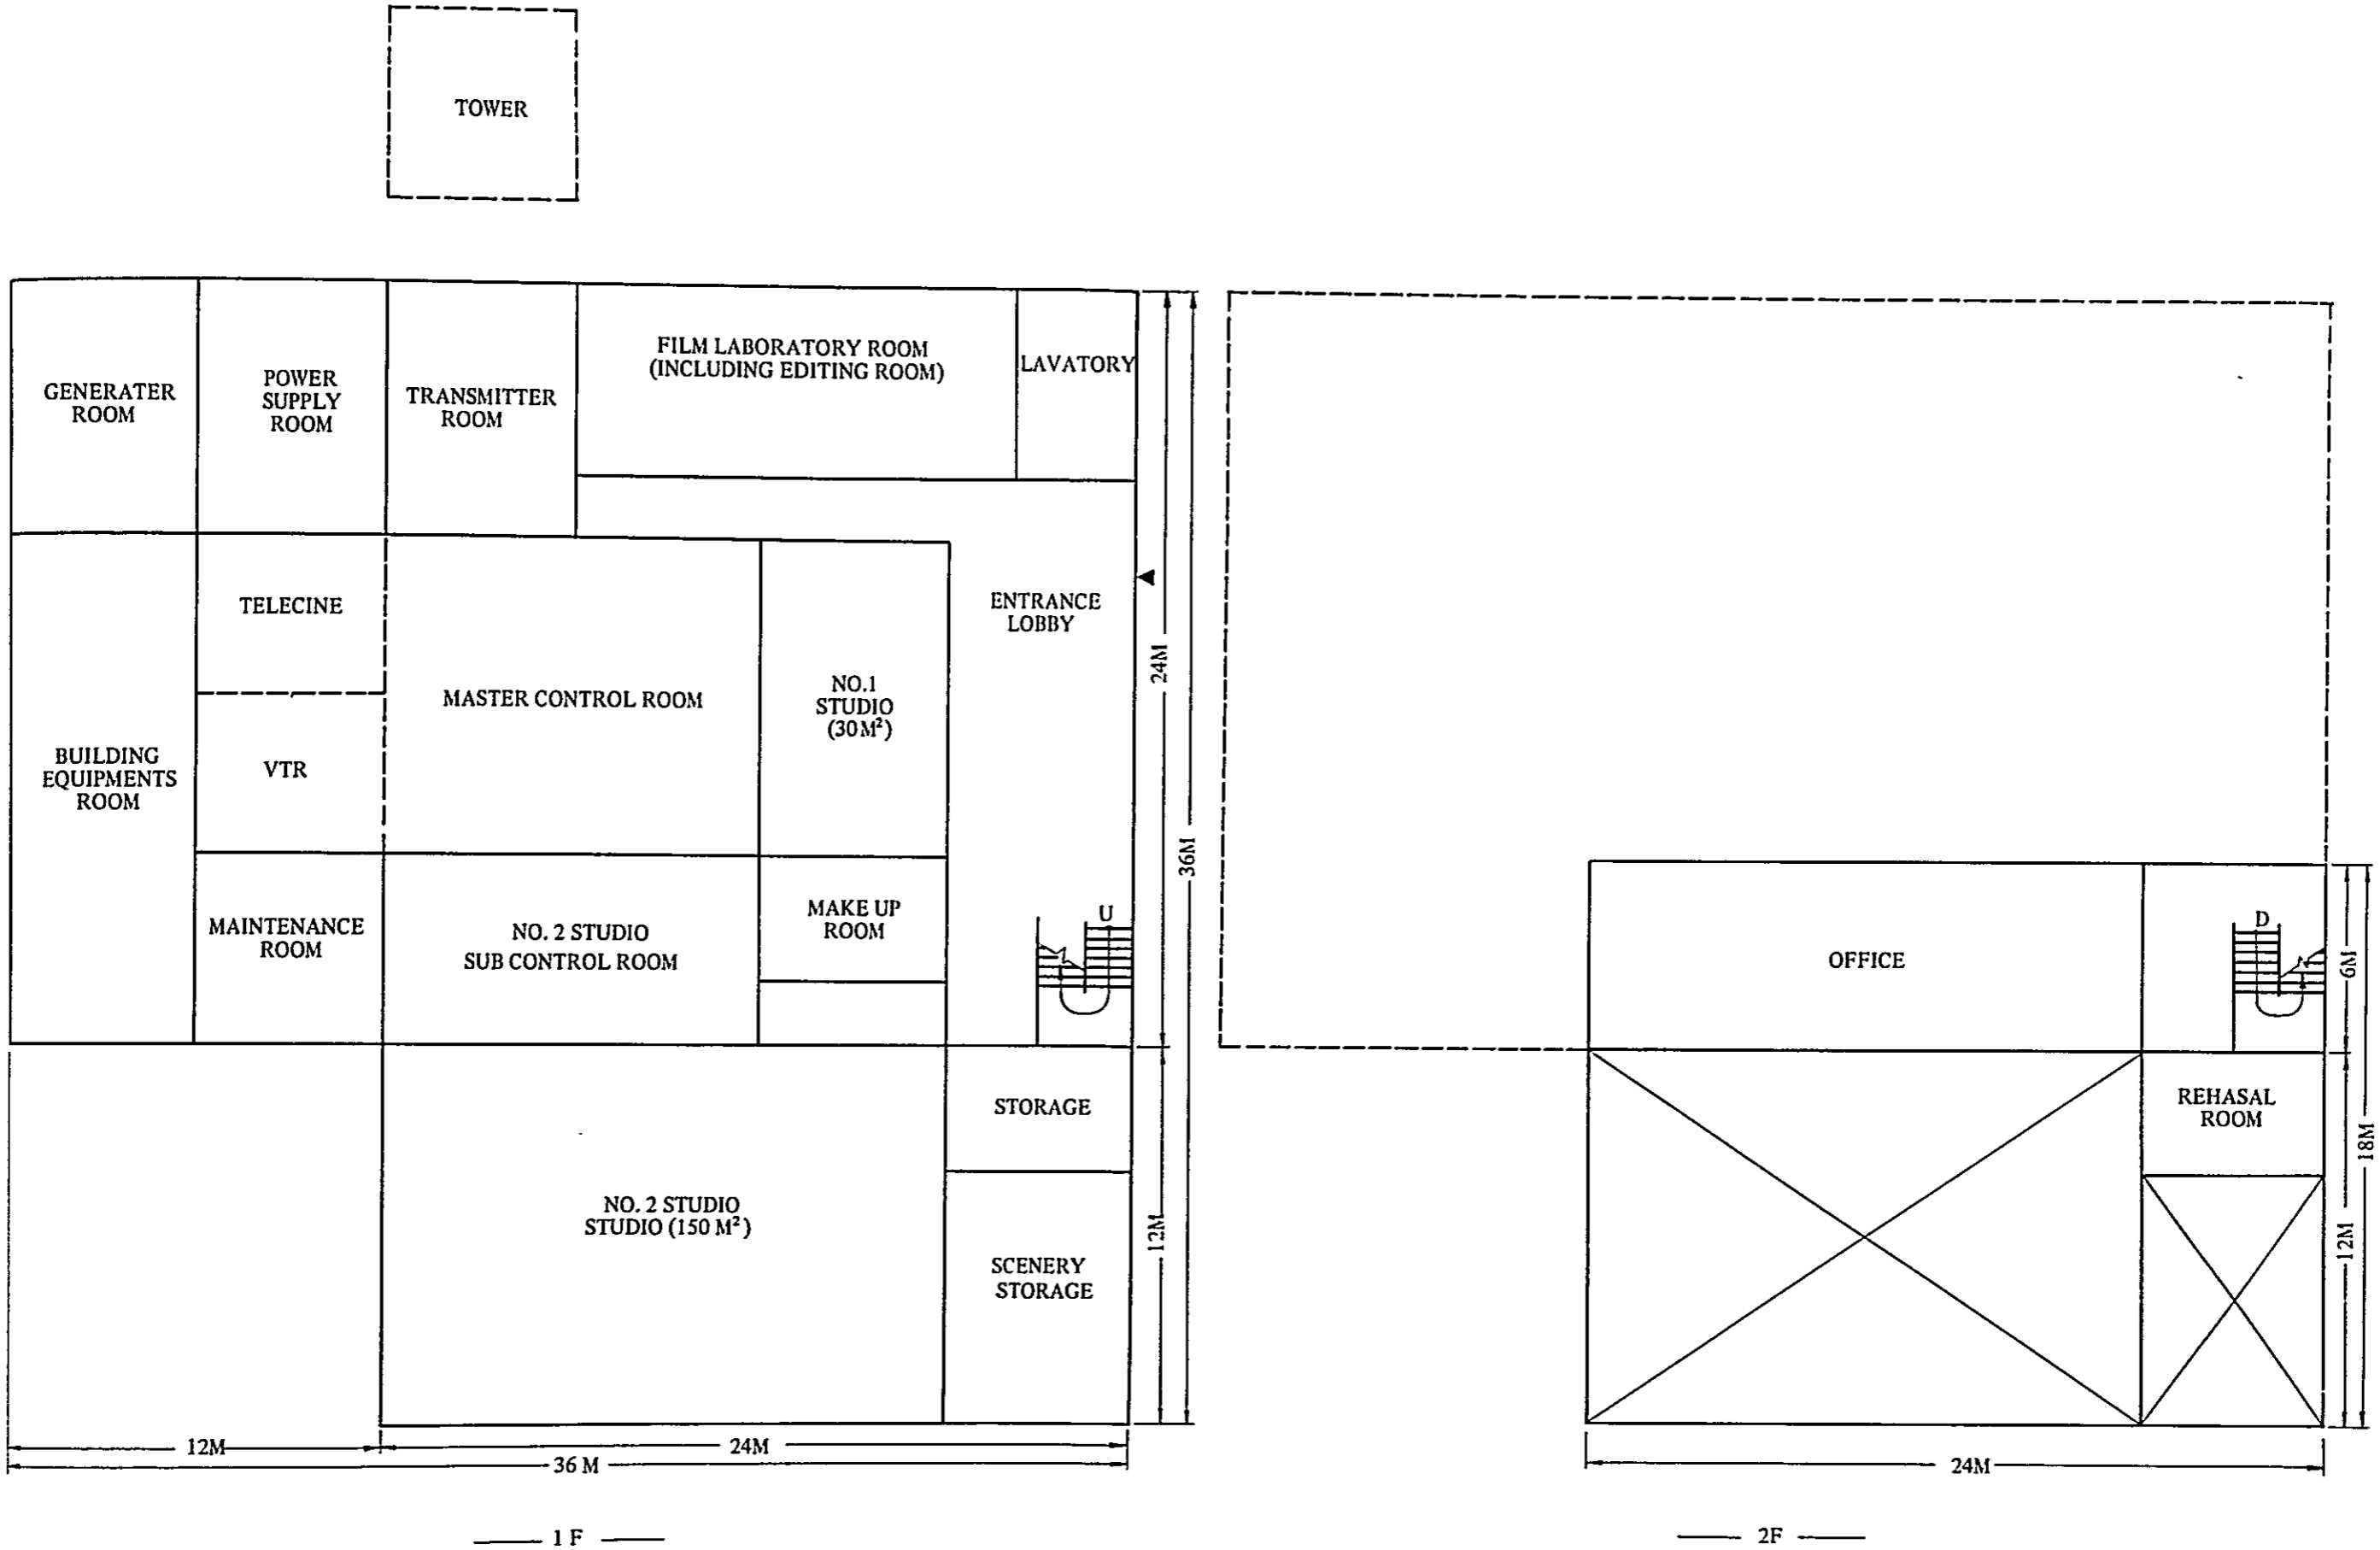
Floor Layout of Main Region Studio Building (An Example)
